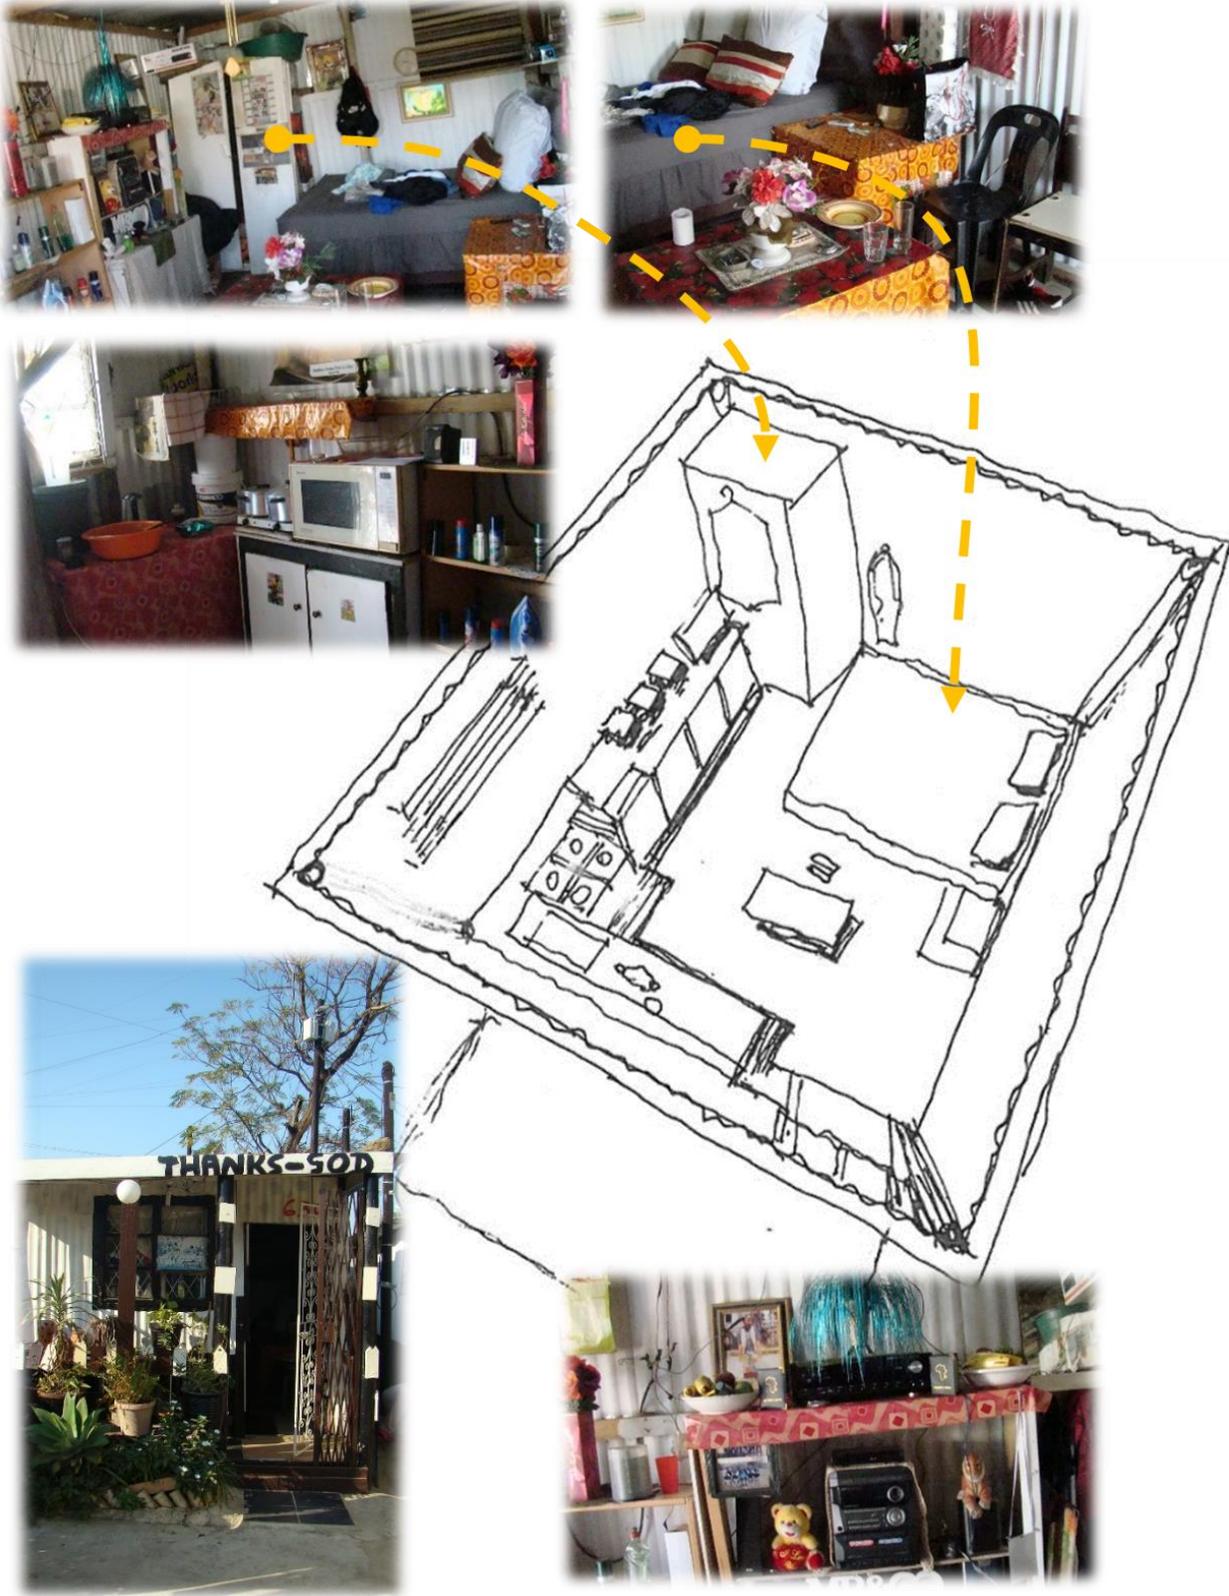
FLOOR PLAN PREPARED BY RESIDENT
